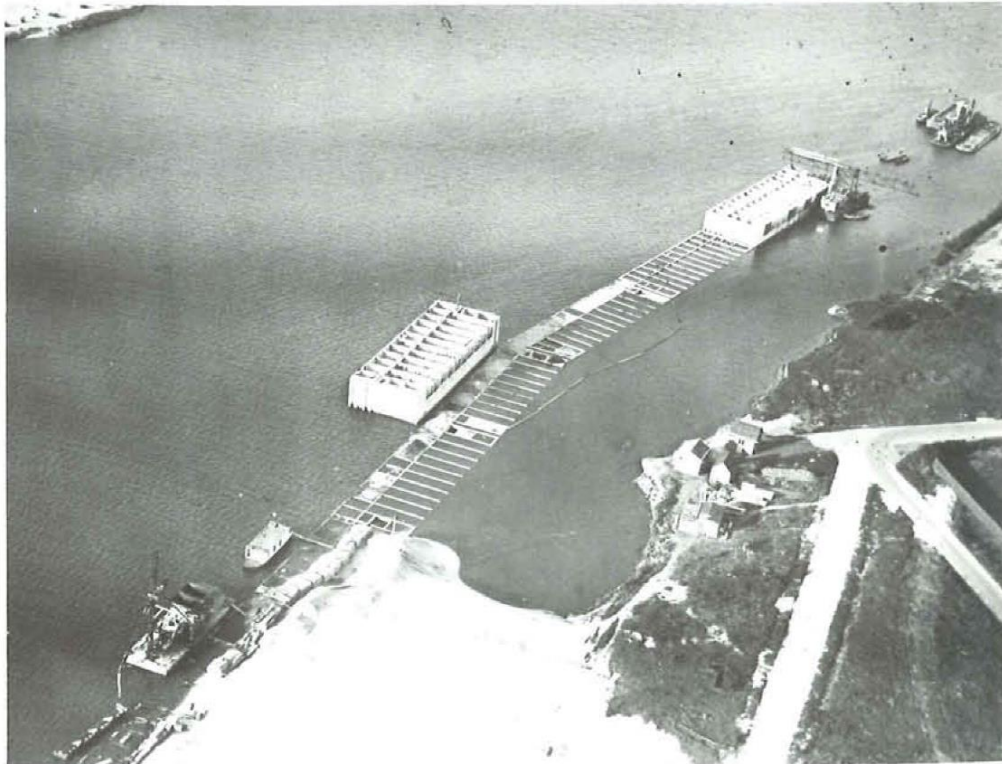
Aerial photo of the construction of the Merwehaven (HBG, 1977)
